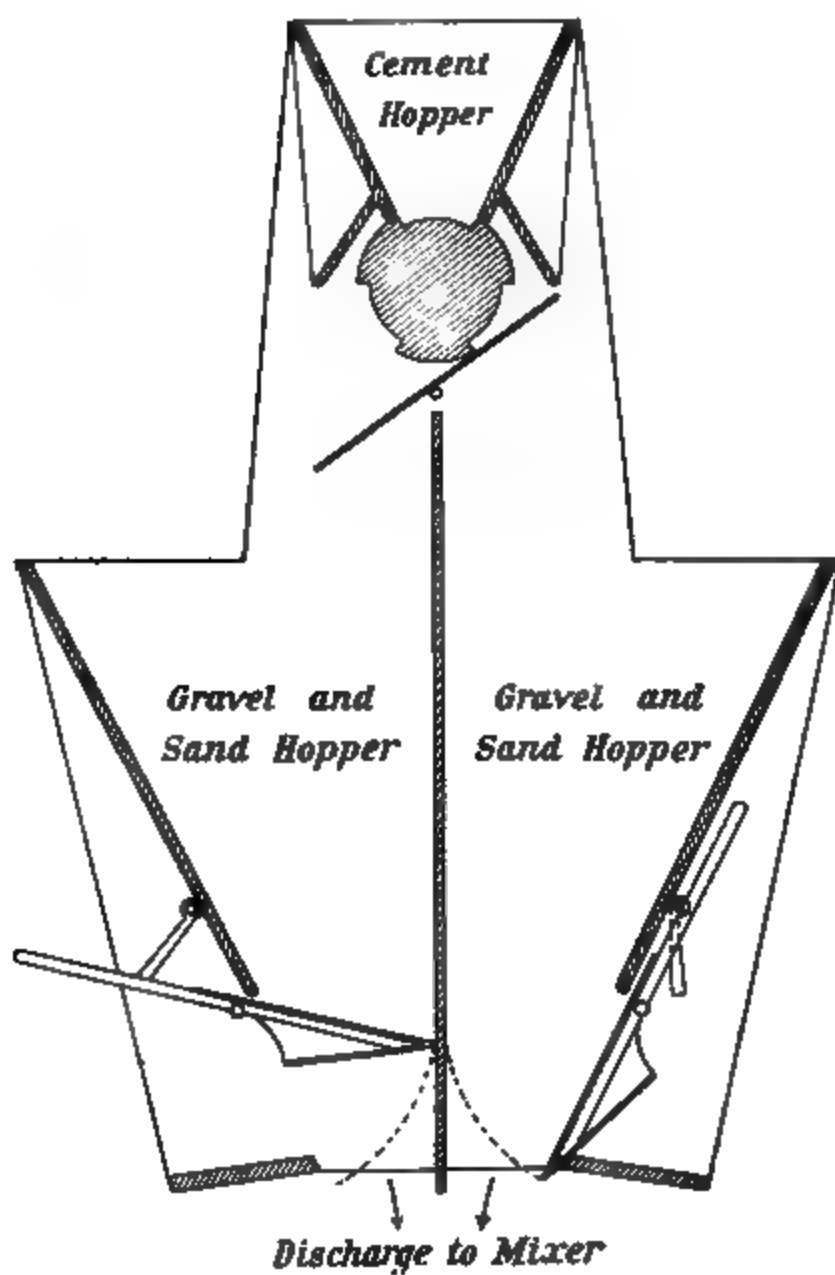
Sutchliffe Concrete Mixer—Section of Hoppers.
